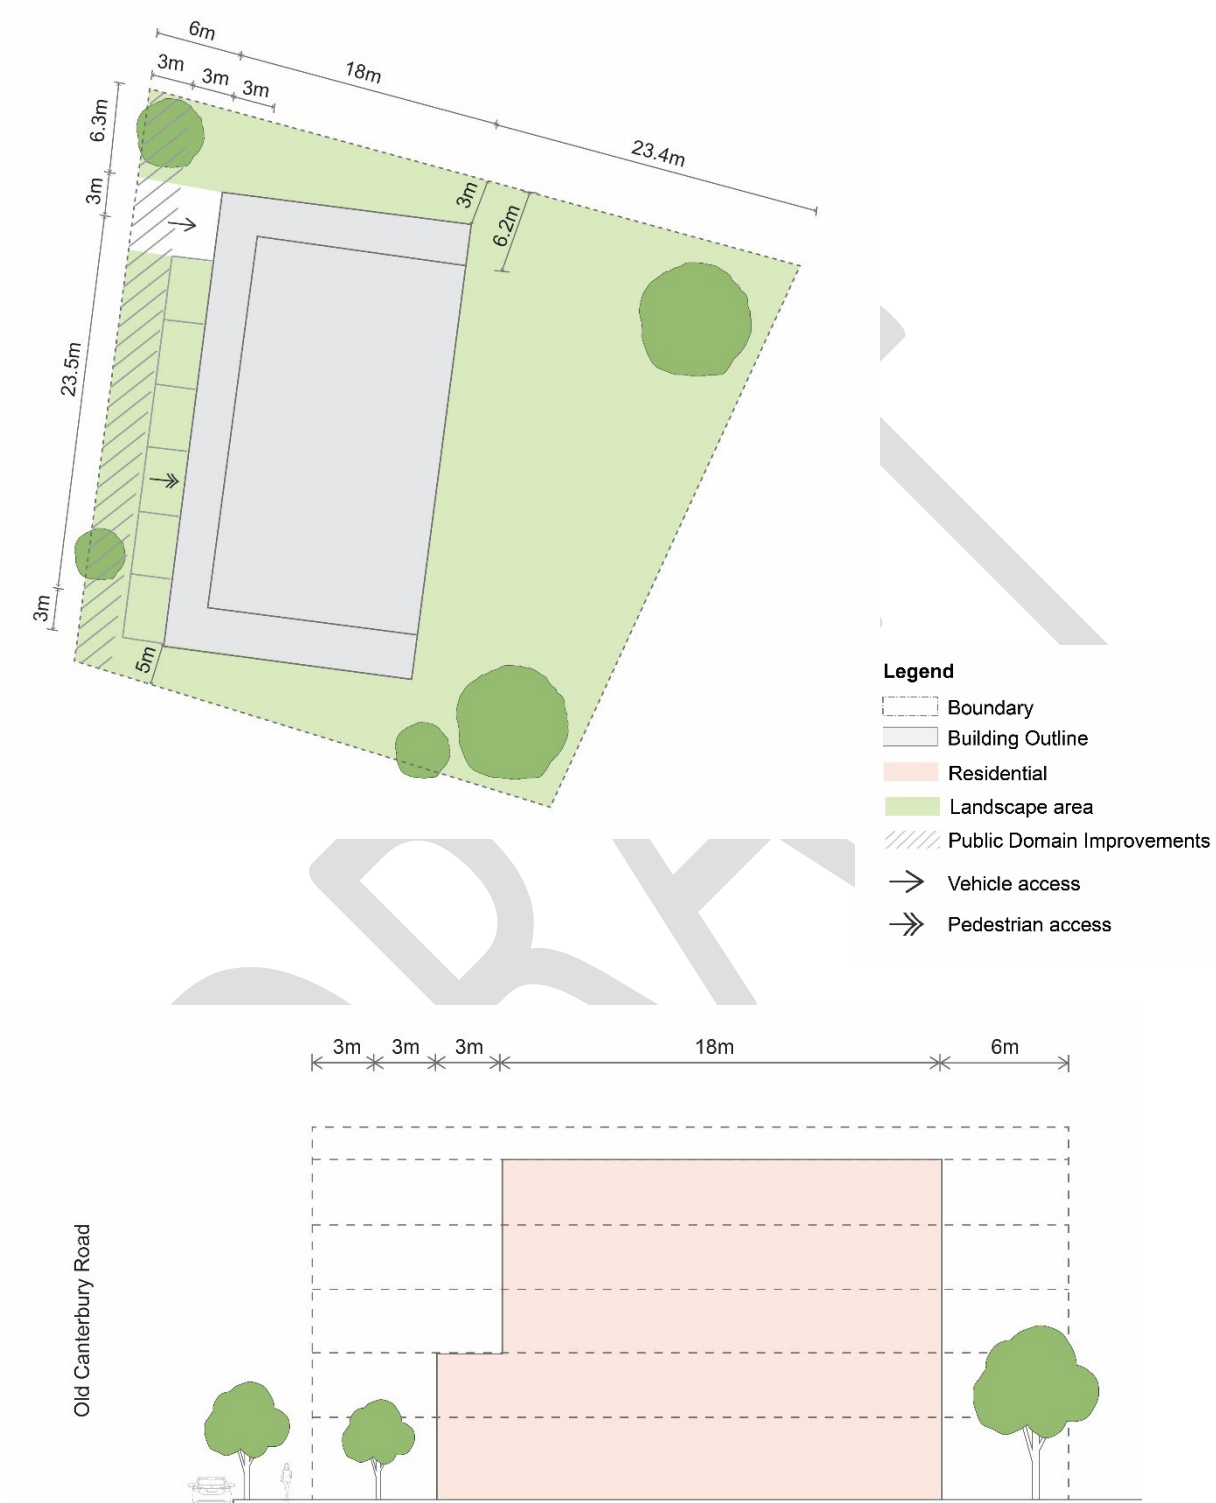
Thomas Street – indicative solution that achieves storeys, building envelope, scale and site layout – plan and section
